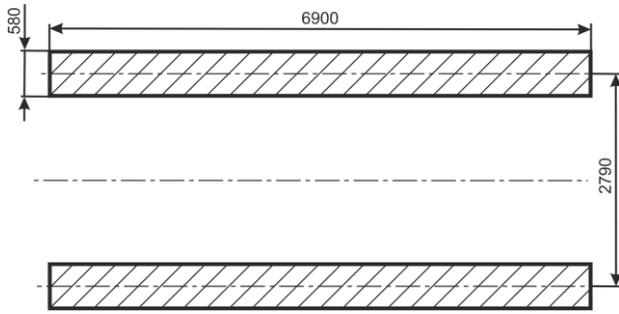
Geometry and dimensions of contact surfaces of belt carriage with the bridge.
